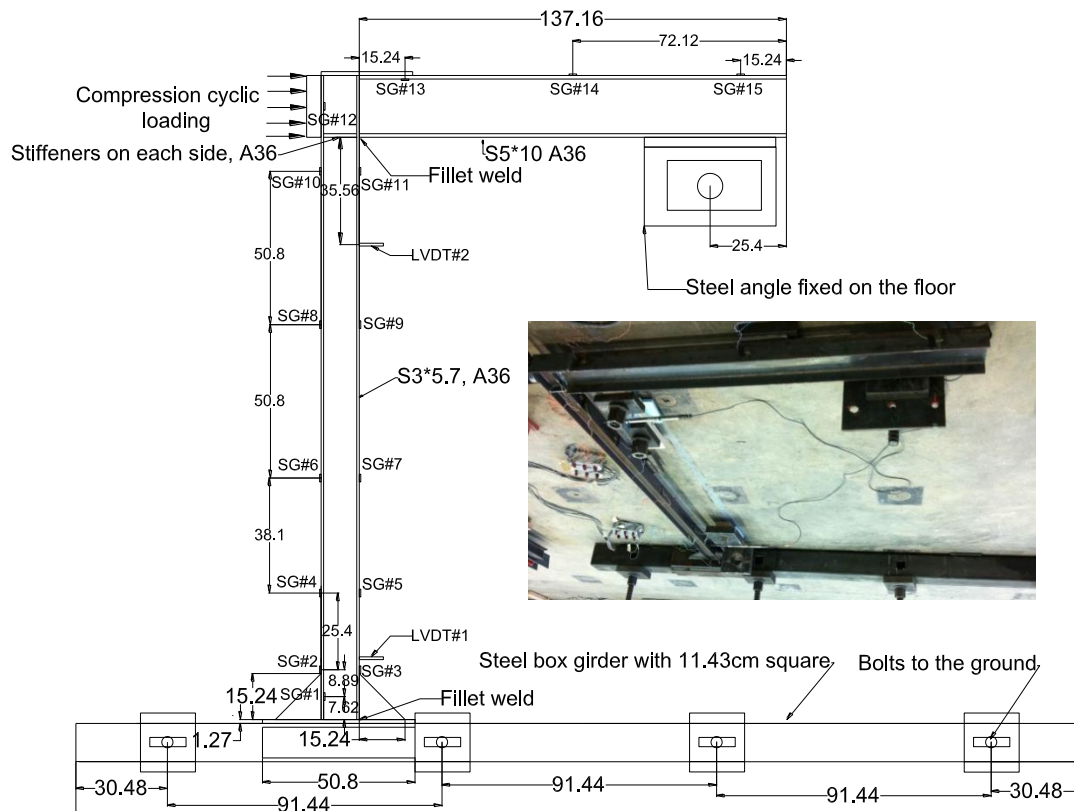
Test setup and instrumentation of the L-shaped steel frame with a prototype inset (unit: cm)
